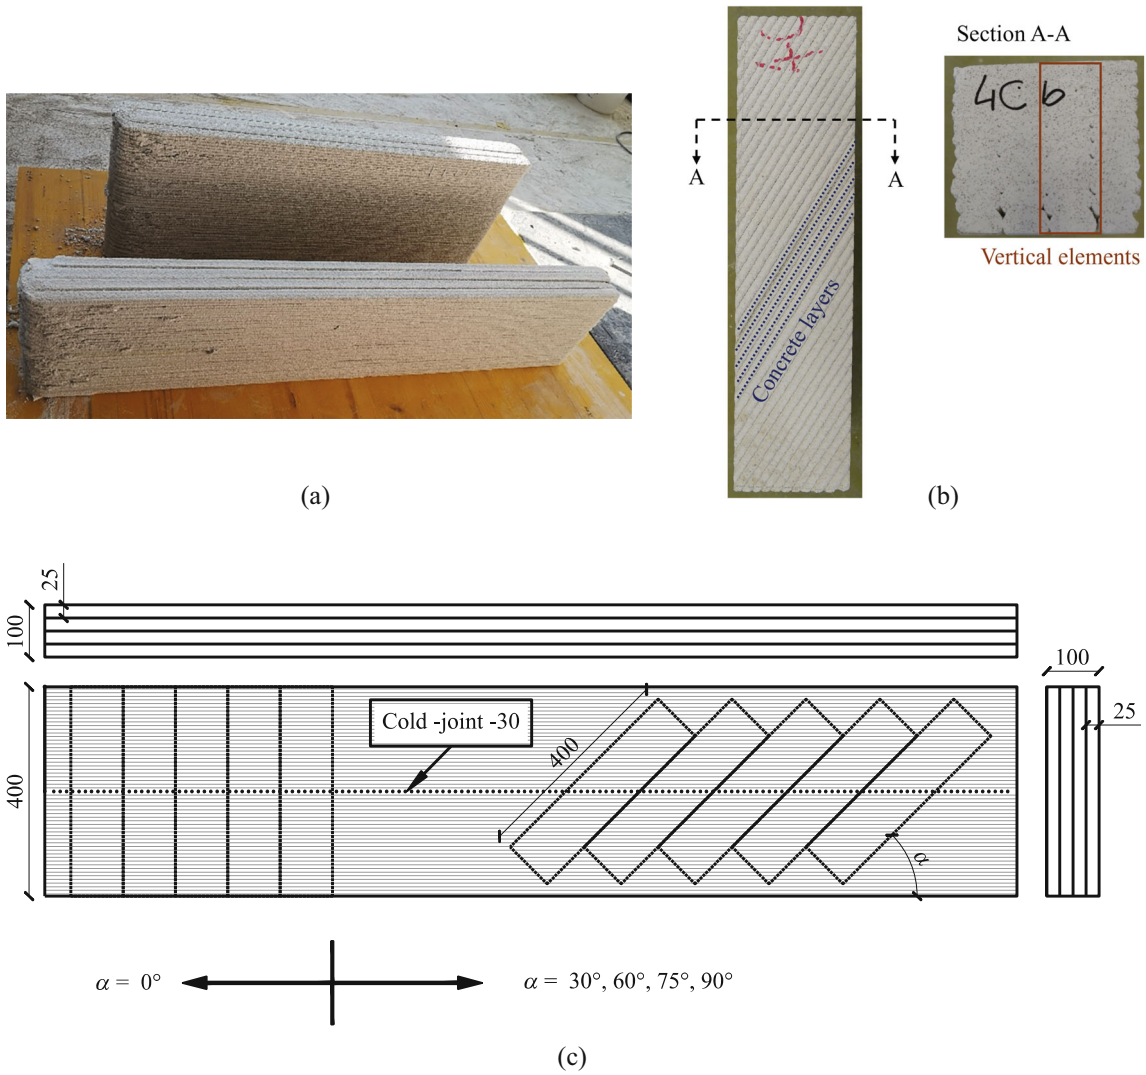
(a) 3D printed concrete walls with Cold Joint-30; (b) specimen cross-section; and (c) example of the cutting layout of the specimens.
